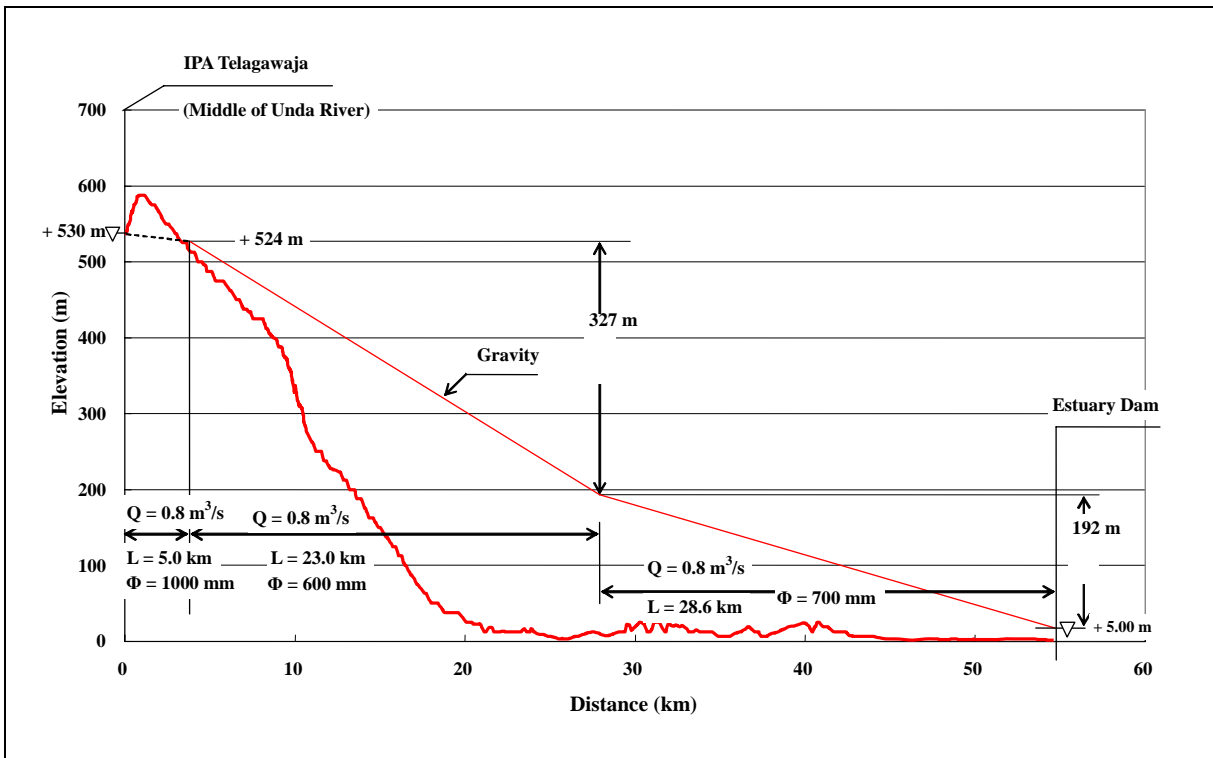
Longitudinal Section and hydraulic Gradient Line of Alternative E2
